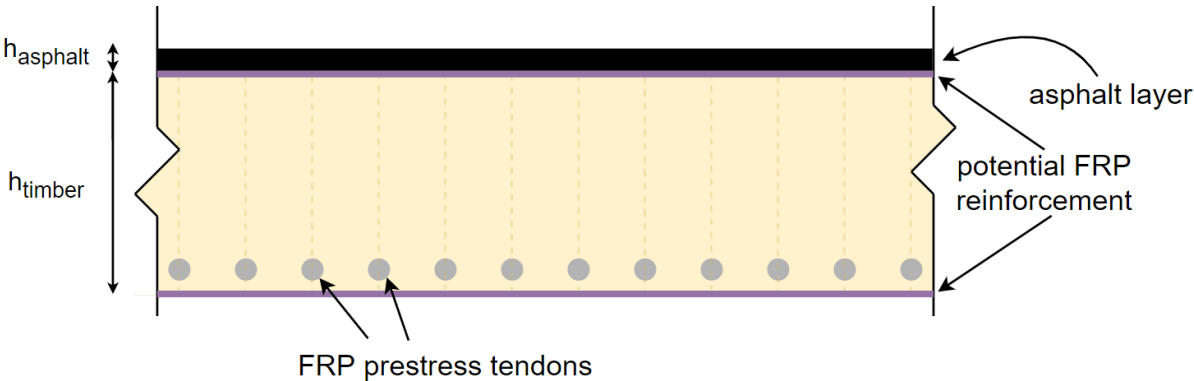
Cross-section A (see Figure 1.3) of the timber deck
